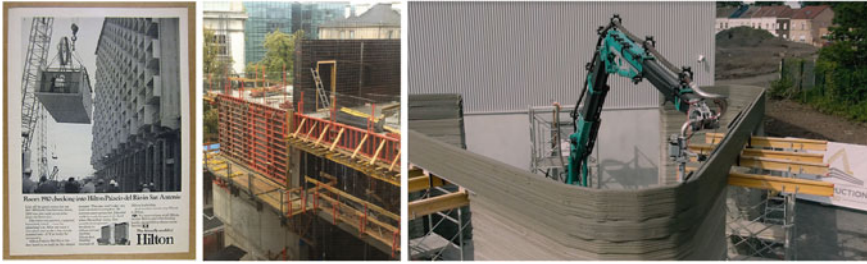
Precast made in the 1950th, on-site construction made with formwork and 3D printed walls (Photo: courtesy of <https://www.constructions-3d.com>)
